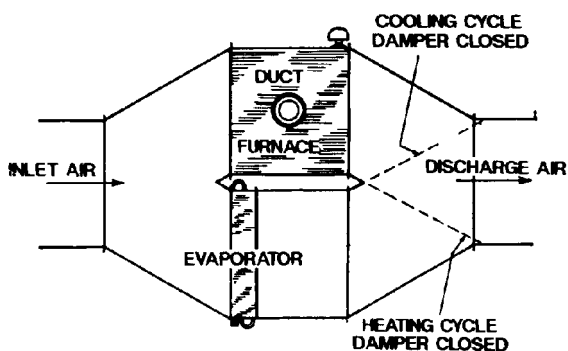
Damper arrangement for duct furnace and cooling coil.
